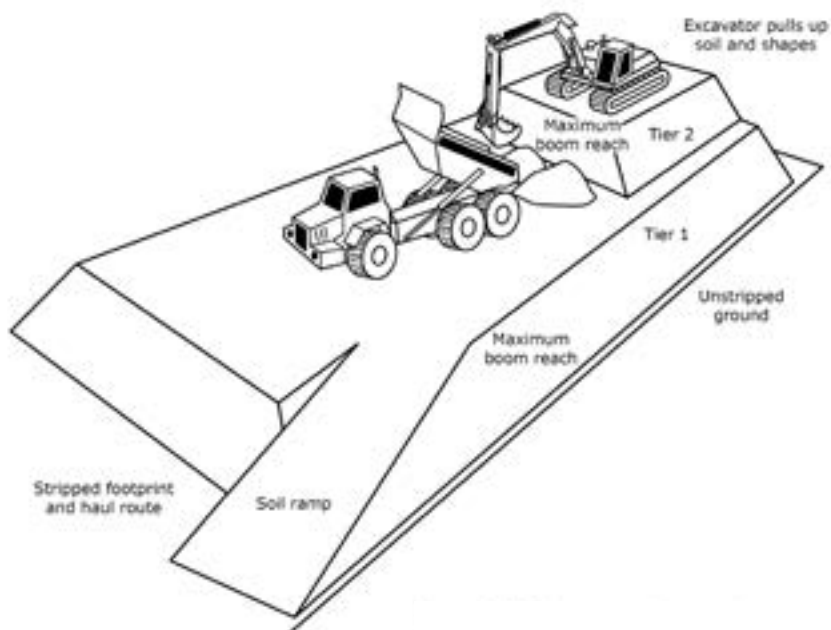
Soil storage mound construction with excavators and dump trucks: Multi-tier mound.
